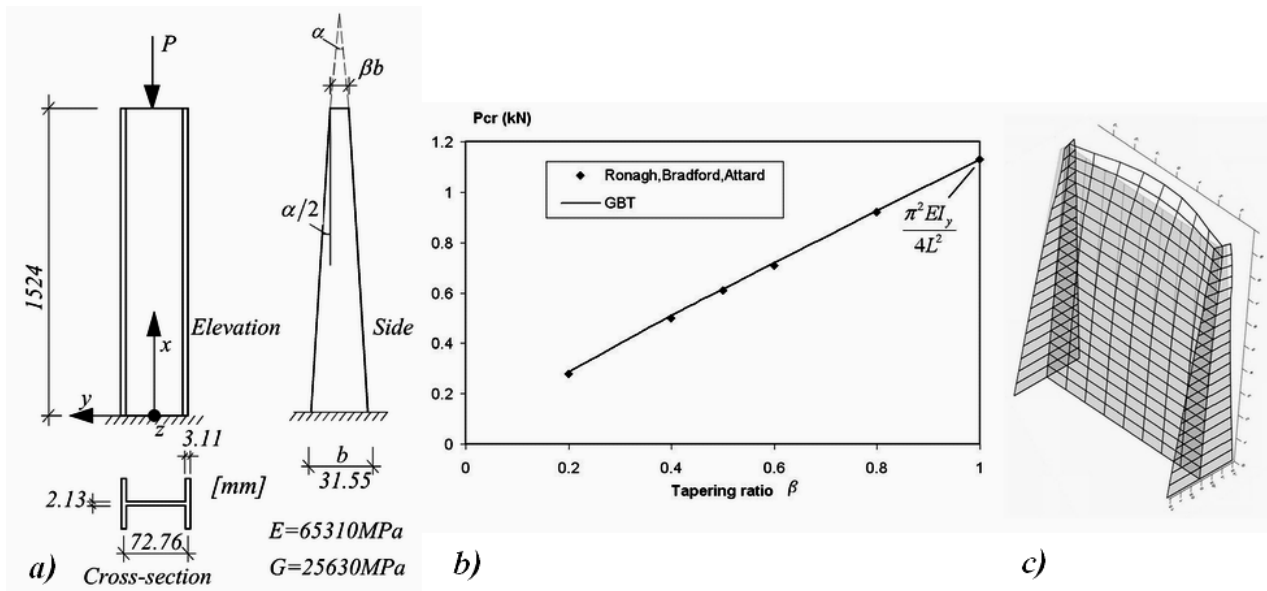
a) Tapered I-section cantilevered column, b) buckling load and c) shape
